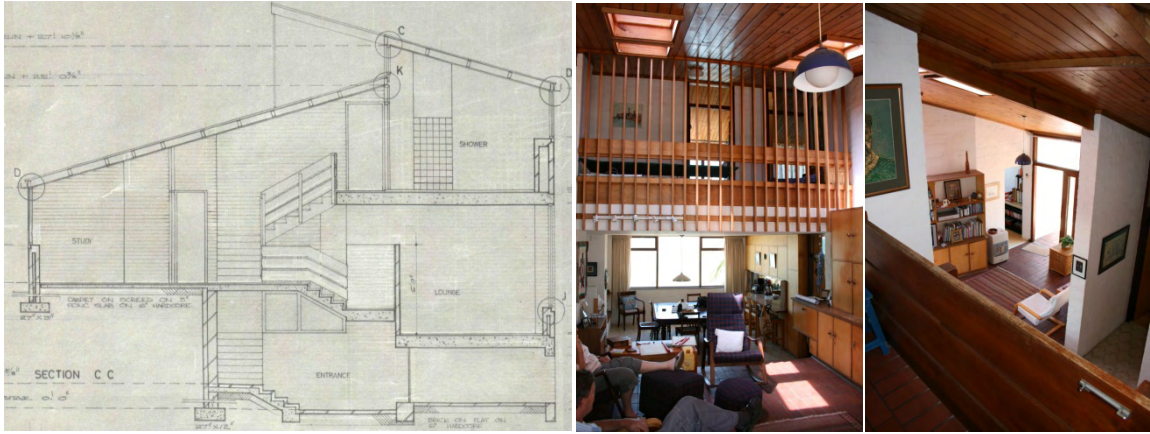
Previous page: First and second floor plans of House Levin (1969) with blue areas demarcating open plan space (Fagan archive - Job No.6910, 24/07/1969 and amended by Author). Left: Section through House Levin (1969) showing balance of open and closed spaces (Fagan archive - Job No. 6910). Middle: View from living room to bedrooms above (Author, 2009). Right: View to living area from bedroom access way (Author, 2009).
